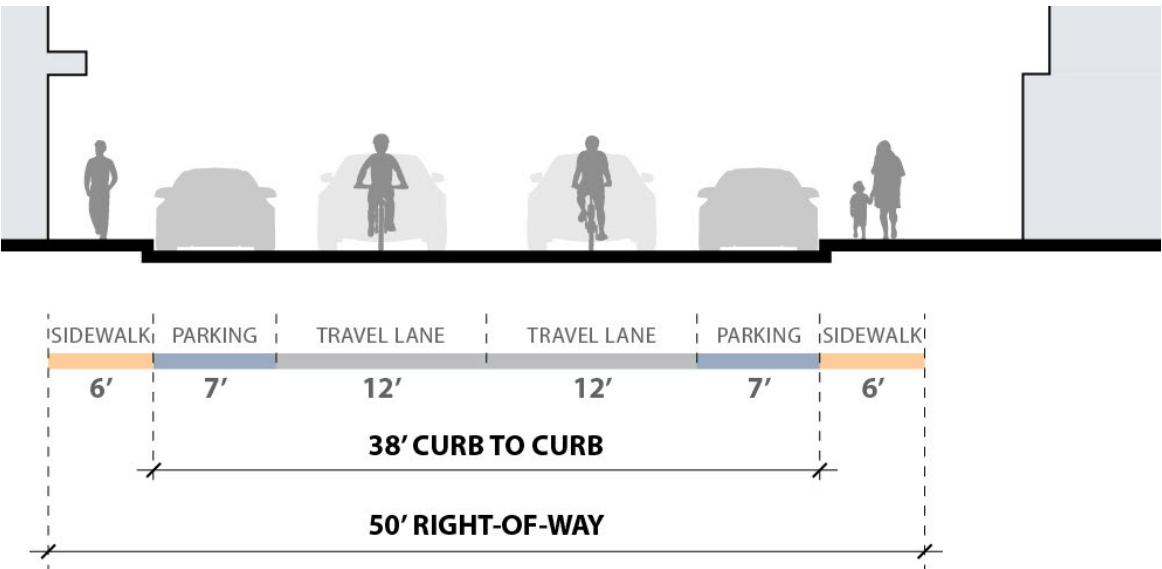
EXISTING STREET CONDITION: ARROYO AVENUE (LOOKING EAST)
